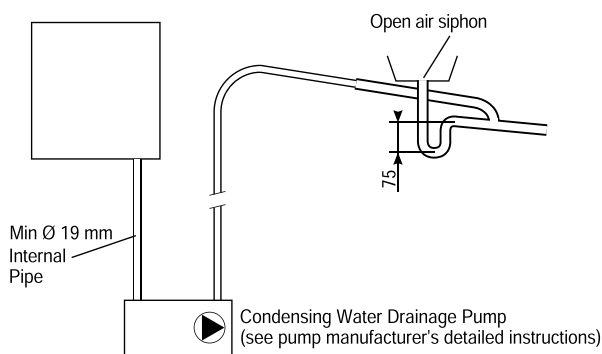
Typical Connection Method of a Condensing Water Drainage Pump (see pump manufacturer's detailed instructions)
